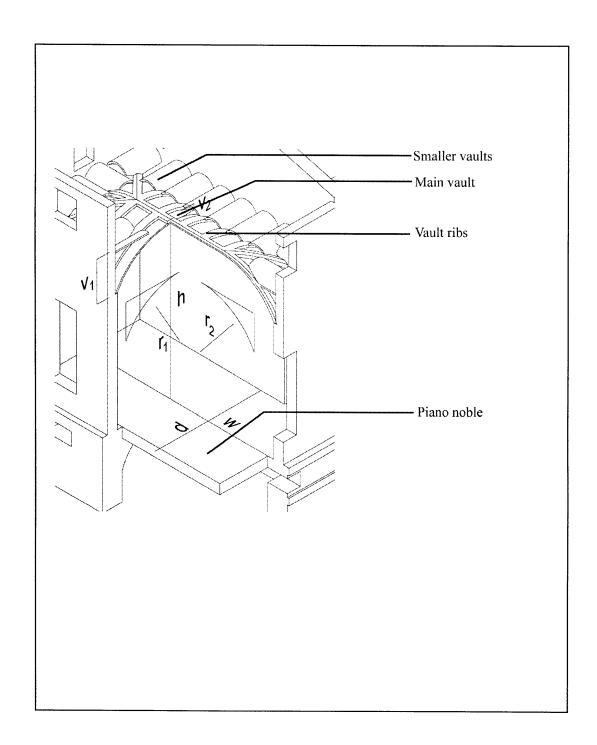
Pavilion vault diagram at the villa Pojana without brick flooring
